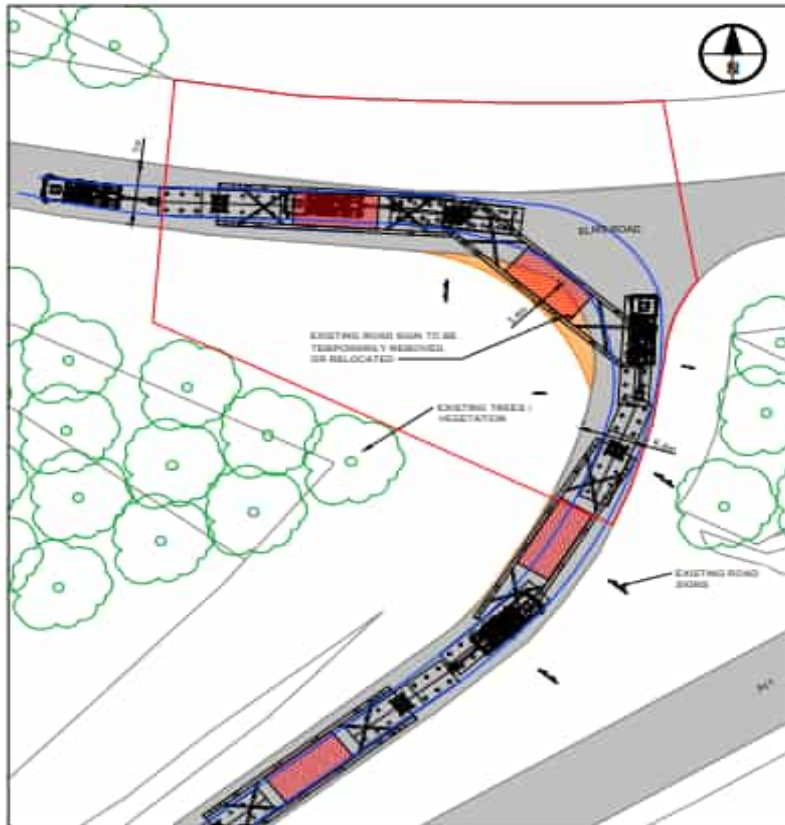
1102 Mildenhall Road / Unnamed Road Junction
